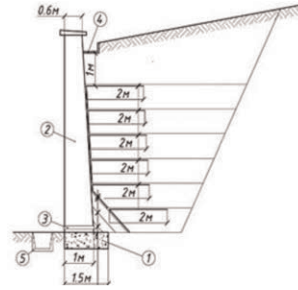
The final view of the landslide protection wall reinforced with geosynthetic materials: 1- foundation reinforced concrete pad; 2 – decorative wall of quarry stone; 3 – asbestos cement drainage pipe; 4 – drainage tray; 5 – storm drain.
